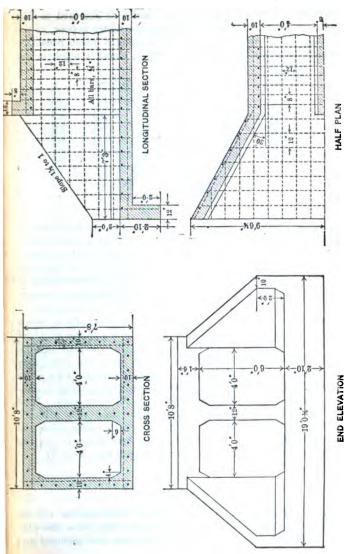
REINFORCED CONCRETE BOX CULVERT.
